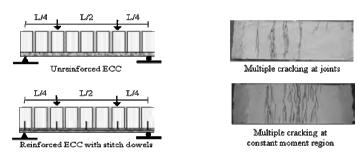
Cracking response of 4-point bend specimens with unreinforced ECC (top) and with ECC reinforced with 0.1% steel (by area) and attached to screw anchors ("Stitch dowels") grouted into the masonry. View from underneath the specimen at the ECC layer.
